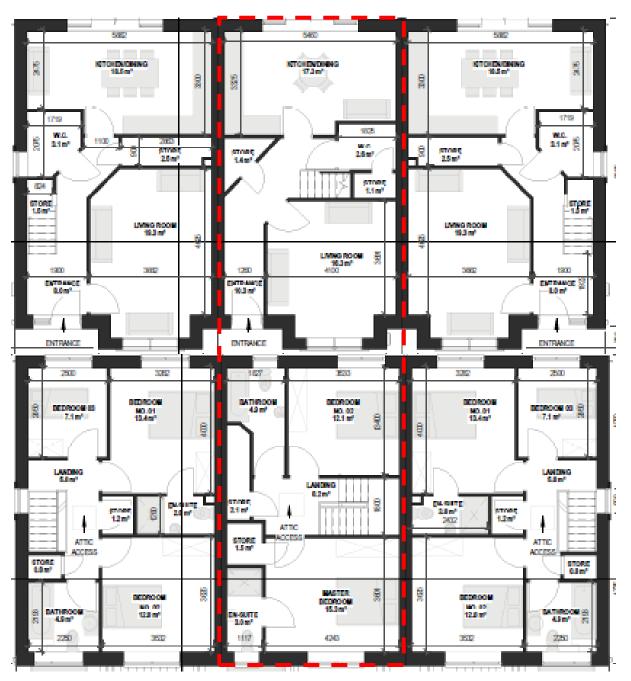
Typical ground floor plan of House Types 5.1 & 5.3 (top) and typical first floor plan of House Types 5.1 & 5.3 (bottom). The area within the red dashed line represents the ground and first floor plans for House Type 5.2.
